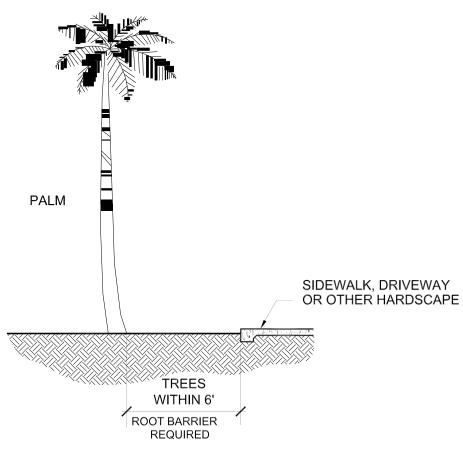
D: ROOT BARRIERS AT WALLS
